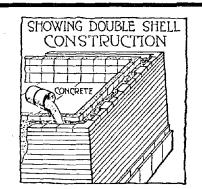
Method of wall construction. Note that this sketch omits steel reinforcing.
